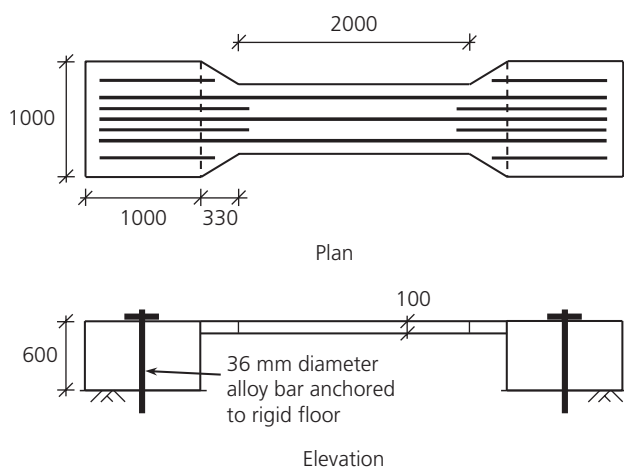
Details of concrete slab specimens tested by Nejadi and Gilbert (2004); dimensions in mm
